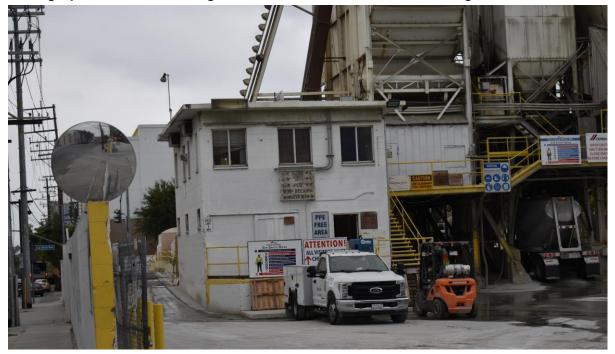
Overview of 1000 North La Brea Avenue, Facing Northeast
